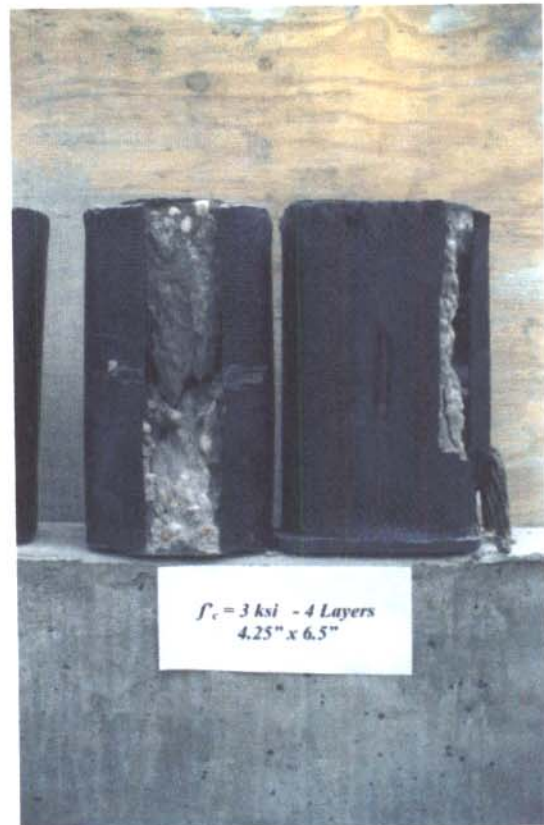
a) - Typical Failure of Specimens ($\alpha_b=0.65$), Series 2: 3 ksi Concrete
